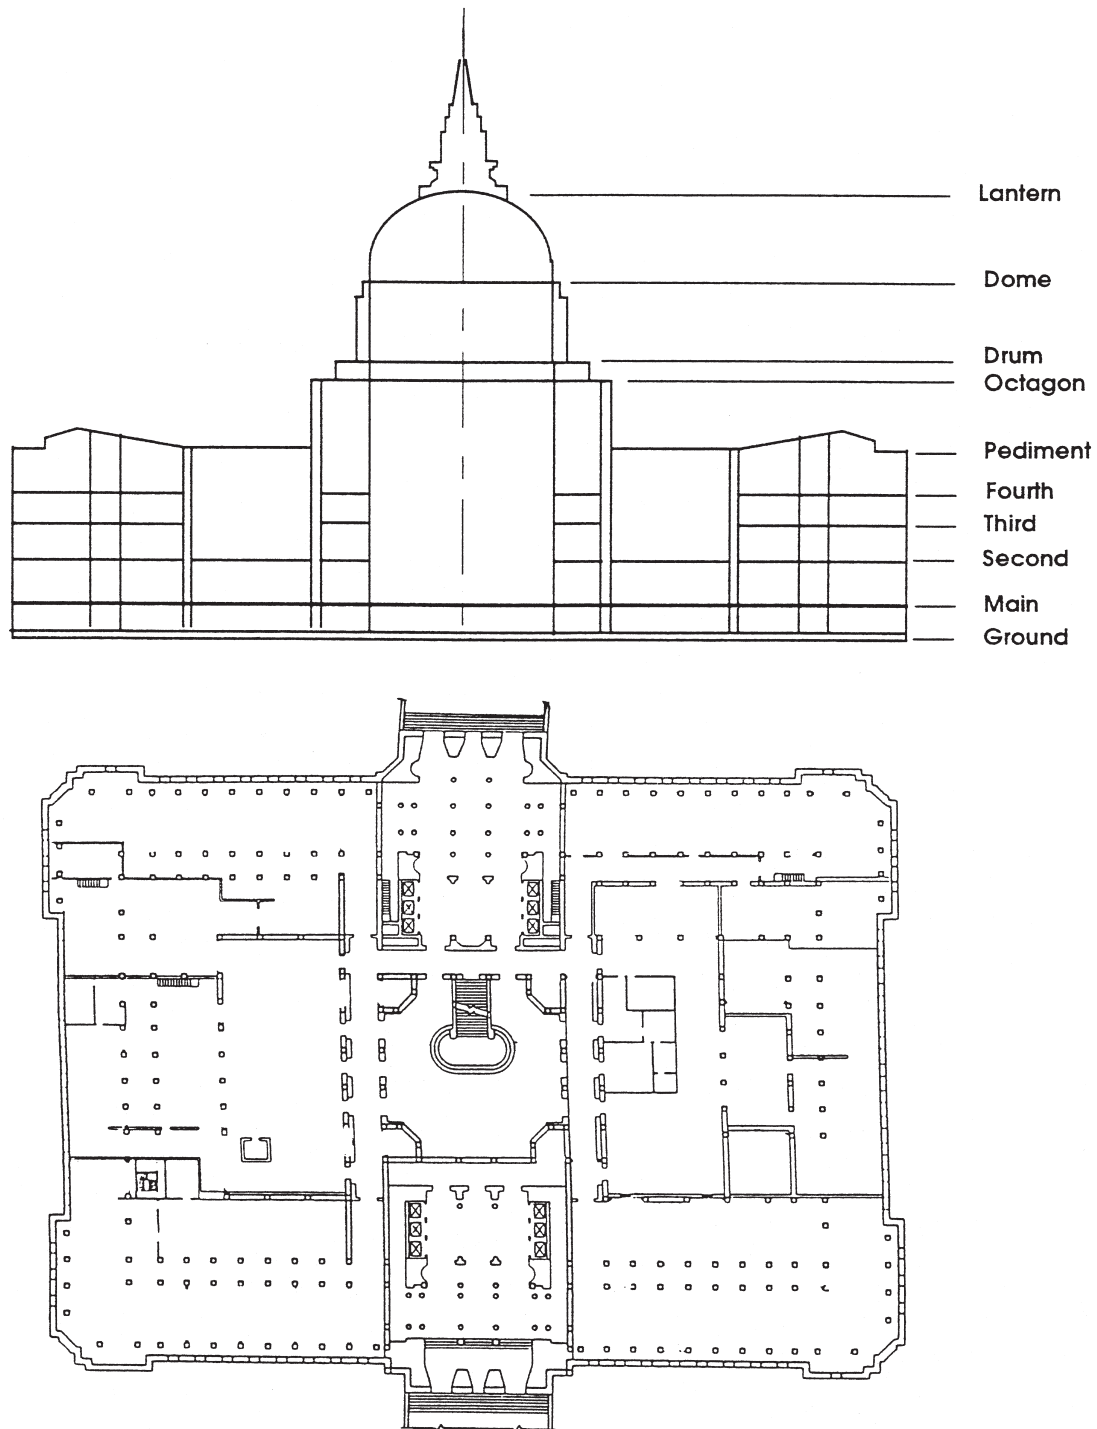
(a) Elevation and (b) main floor plan of the San Francisco City Hall.
